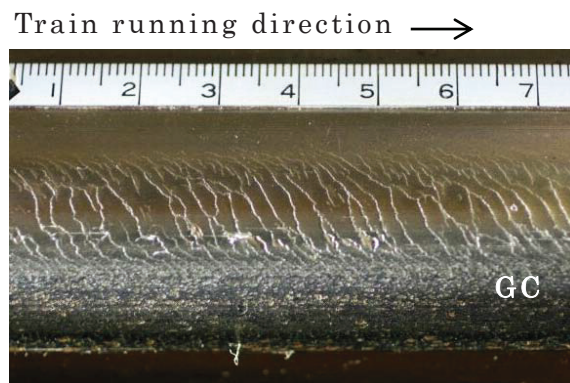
Appearance of head checking formed in the gauge corner of the standard carbon rail [30].
